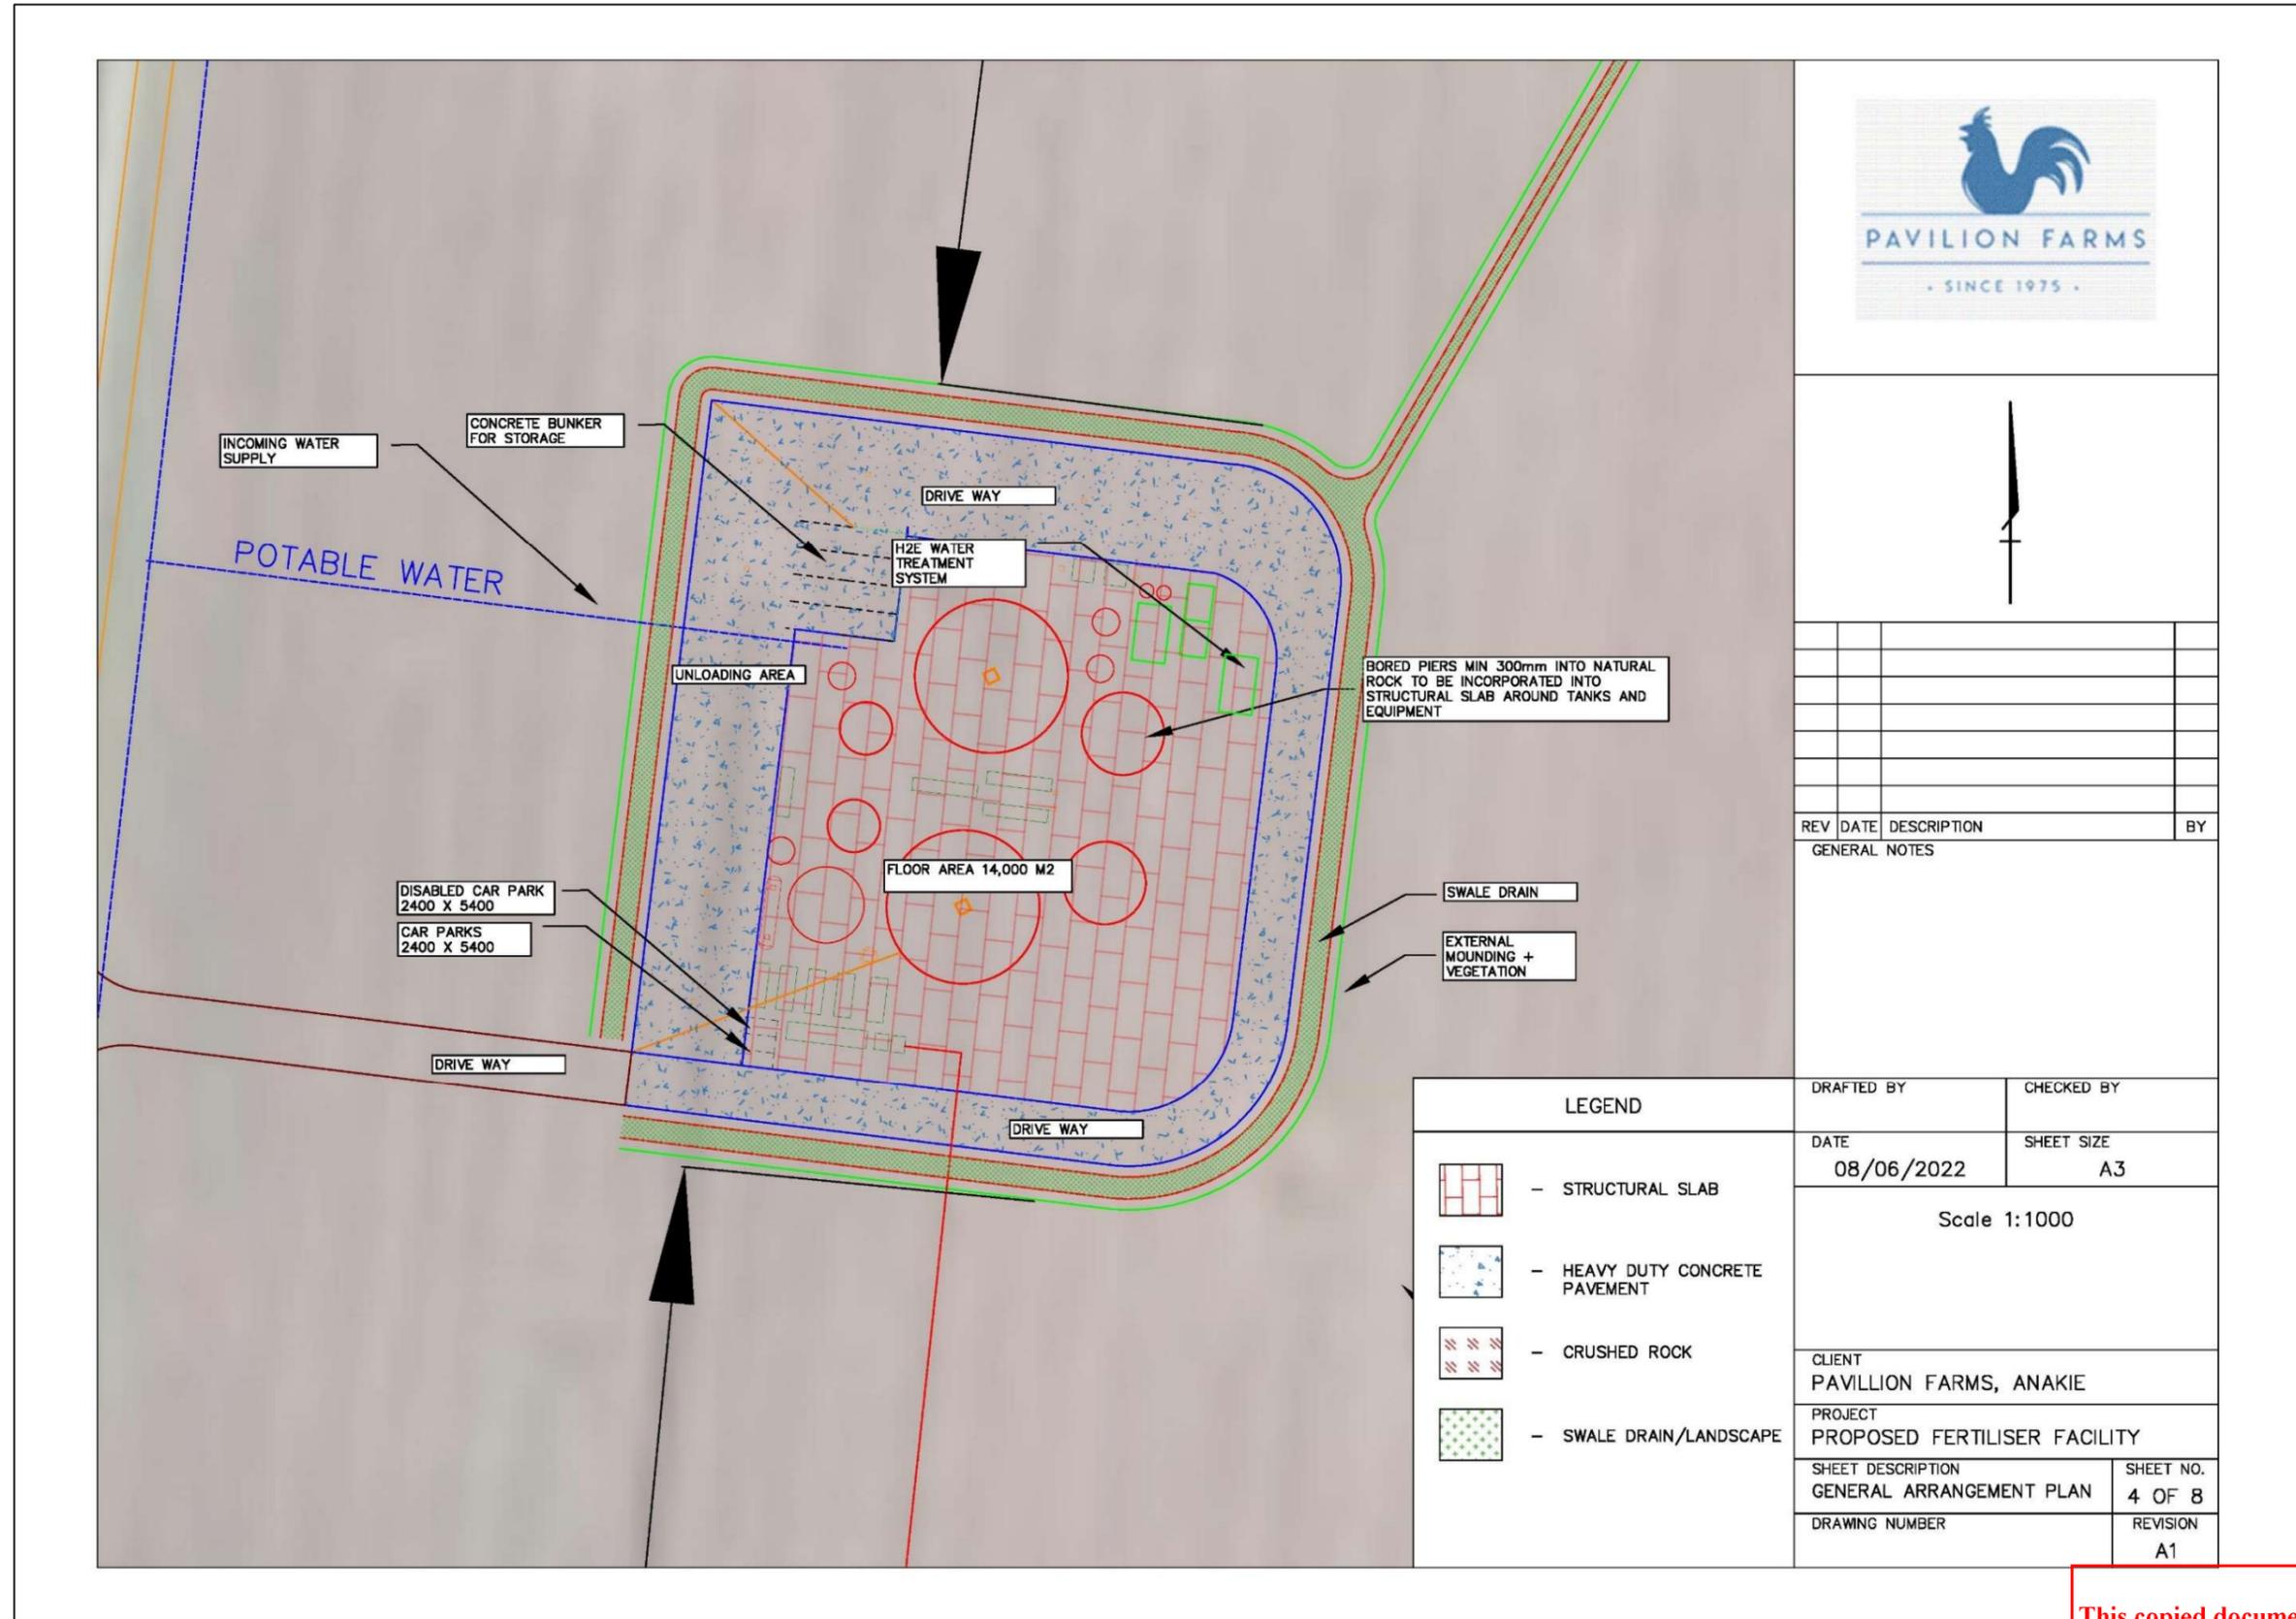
General arrangement plan of the Proposed Fertiliser Facility
